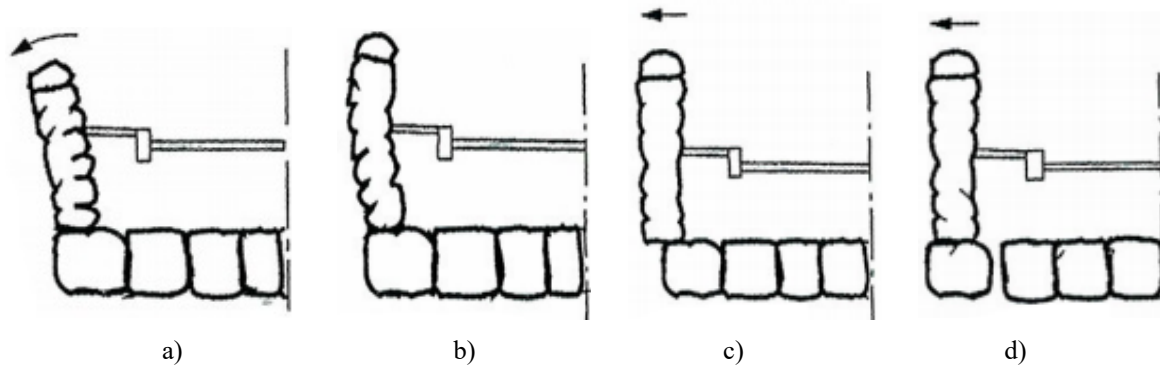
Failure mechanisms of spandrel walls: tilting (a); bulging (b); sliding (c); detachment (d).
